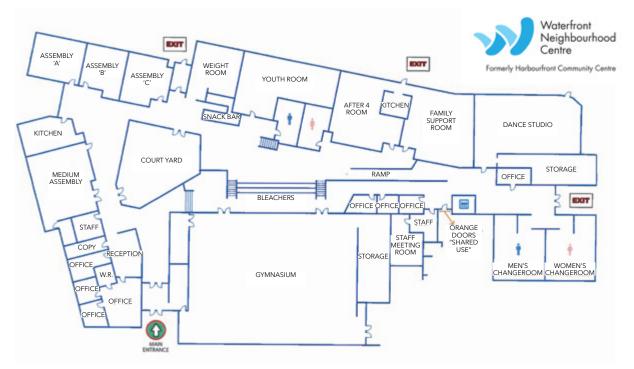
Waterfront Neighbourhood Centre (WNC) Existing Floor Plan
